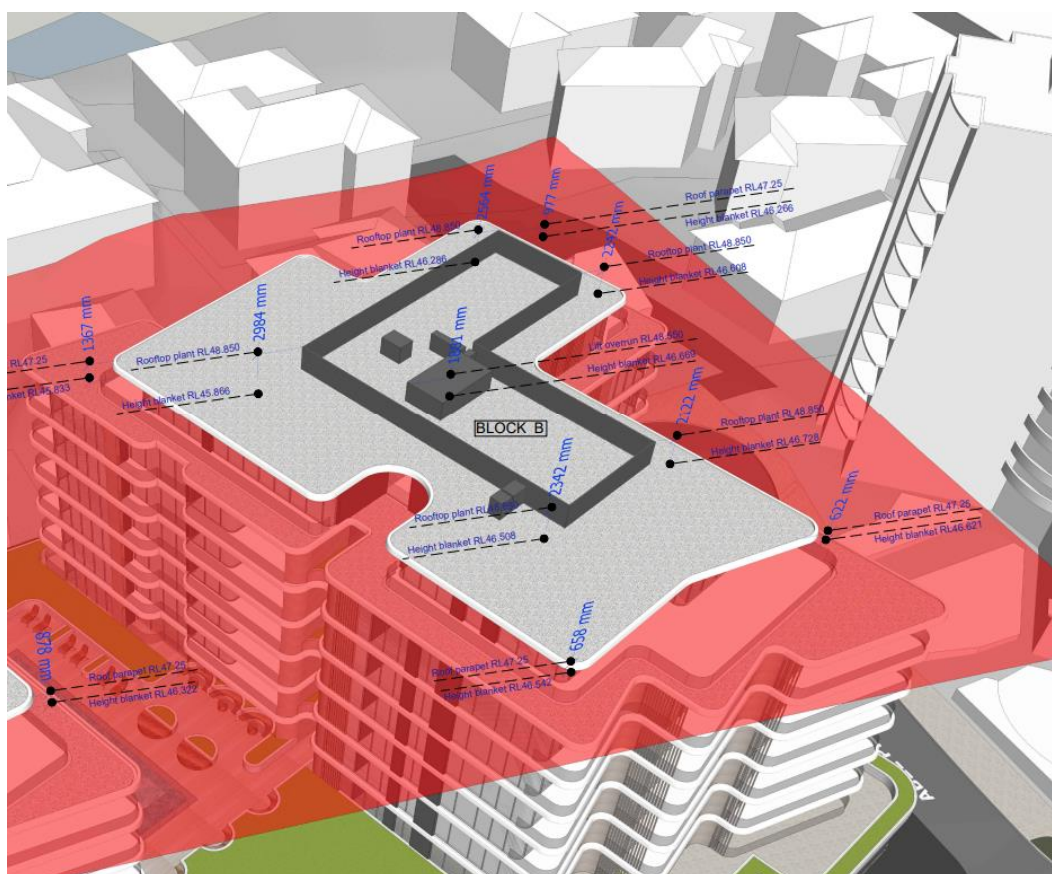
Close up of height plane for Building B. (Source: PBD Architects)
